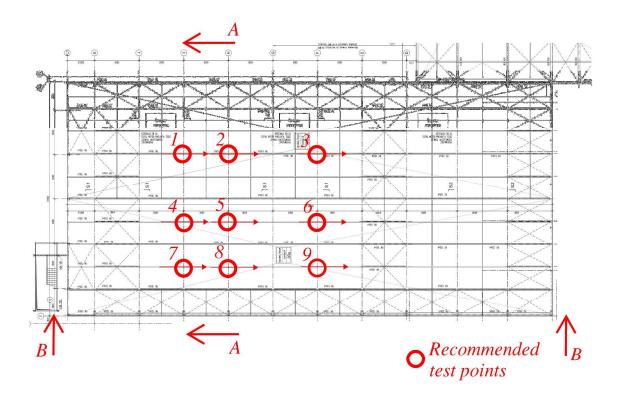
Examples of recommended testing points in a slender roof structure, plane view.
